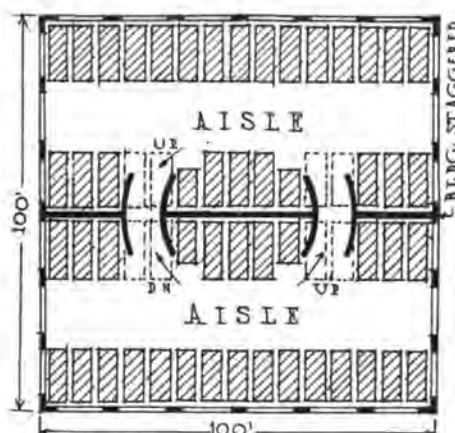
Typical Floor Plan of Garage with Patent Ramp Design and Staggered Floors. Capacity per Floor 52 Cars
